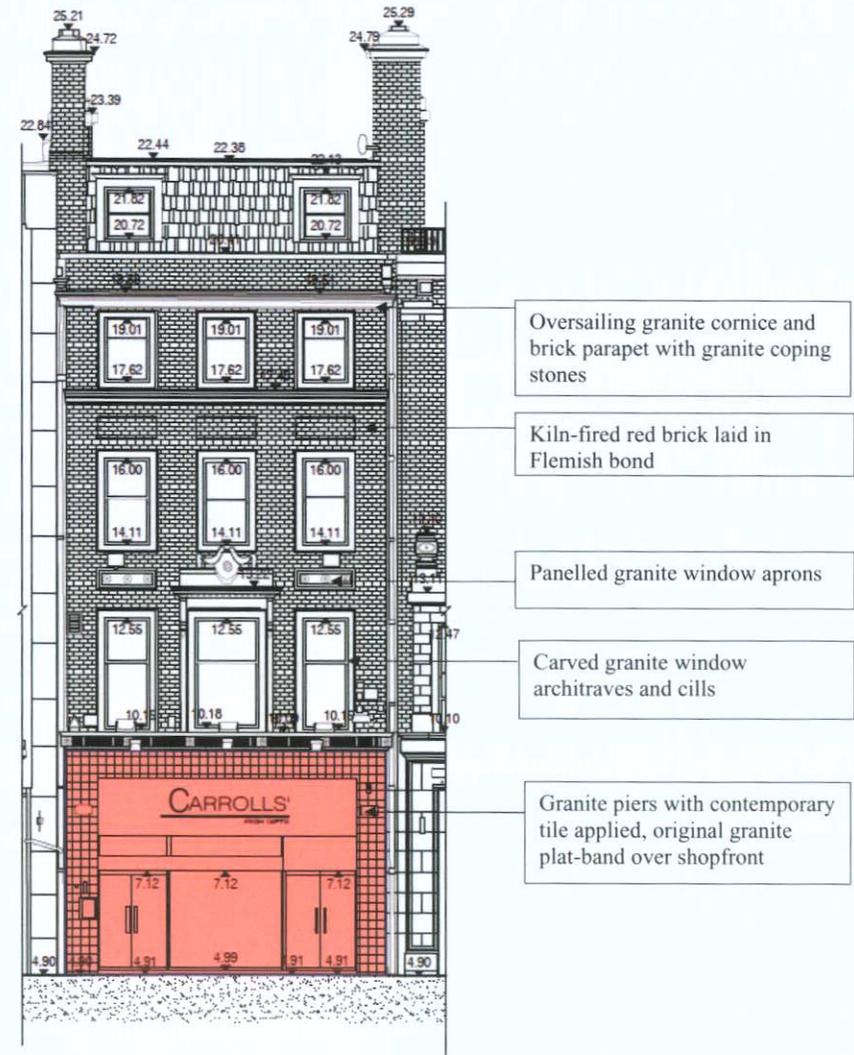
Note: Drawings are not to scale. The drawings within this report are for illustrative purposes only. Please refer to detailed drawings submitted with the application for accurate dimensions and information.
